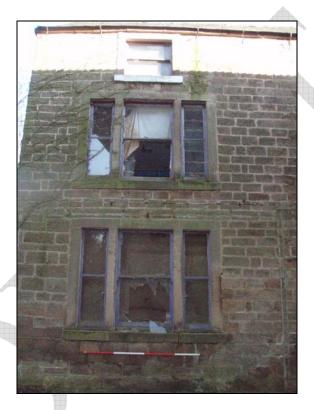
Photograph of a standard window (ground and first floor) and small window (second floor) of the south-west façade of the house (facing north-east)
